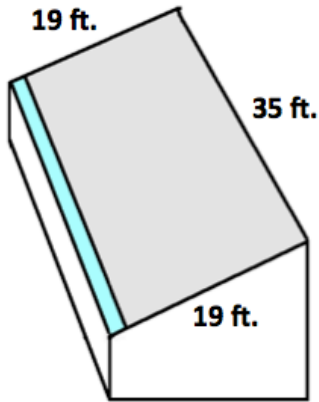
A picture of the section of roof that will be used to catch water for the system, created by the RainBeaus on 11/17/14
